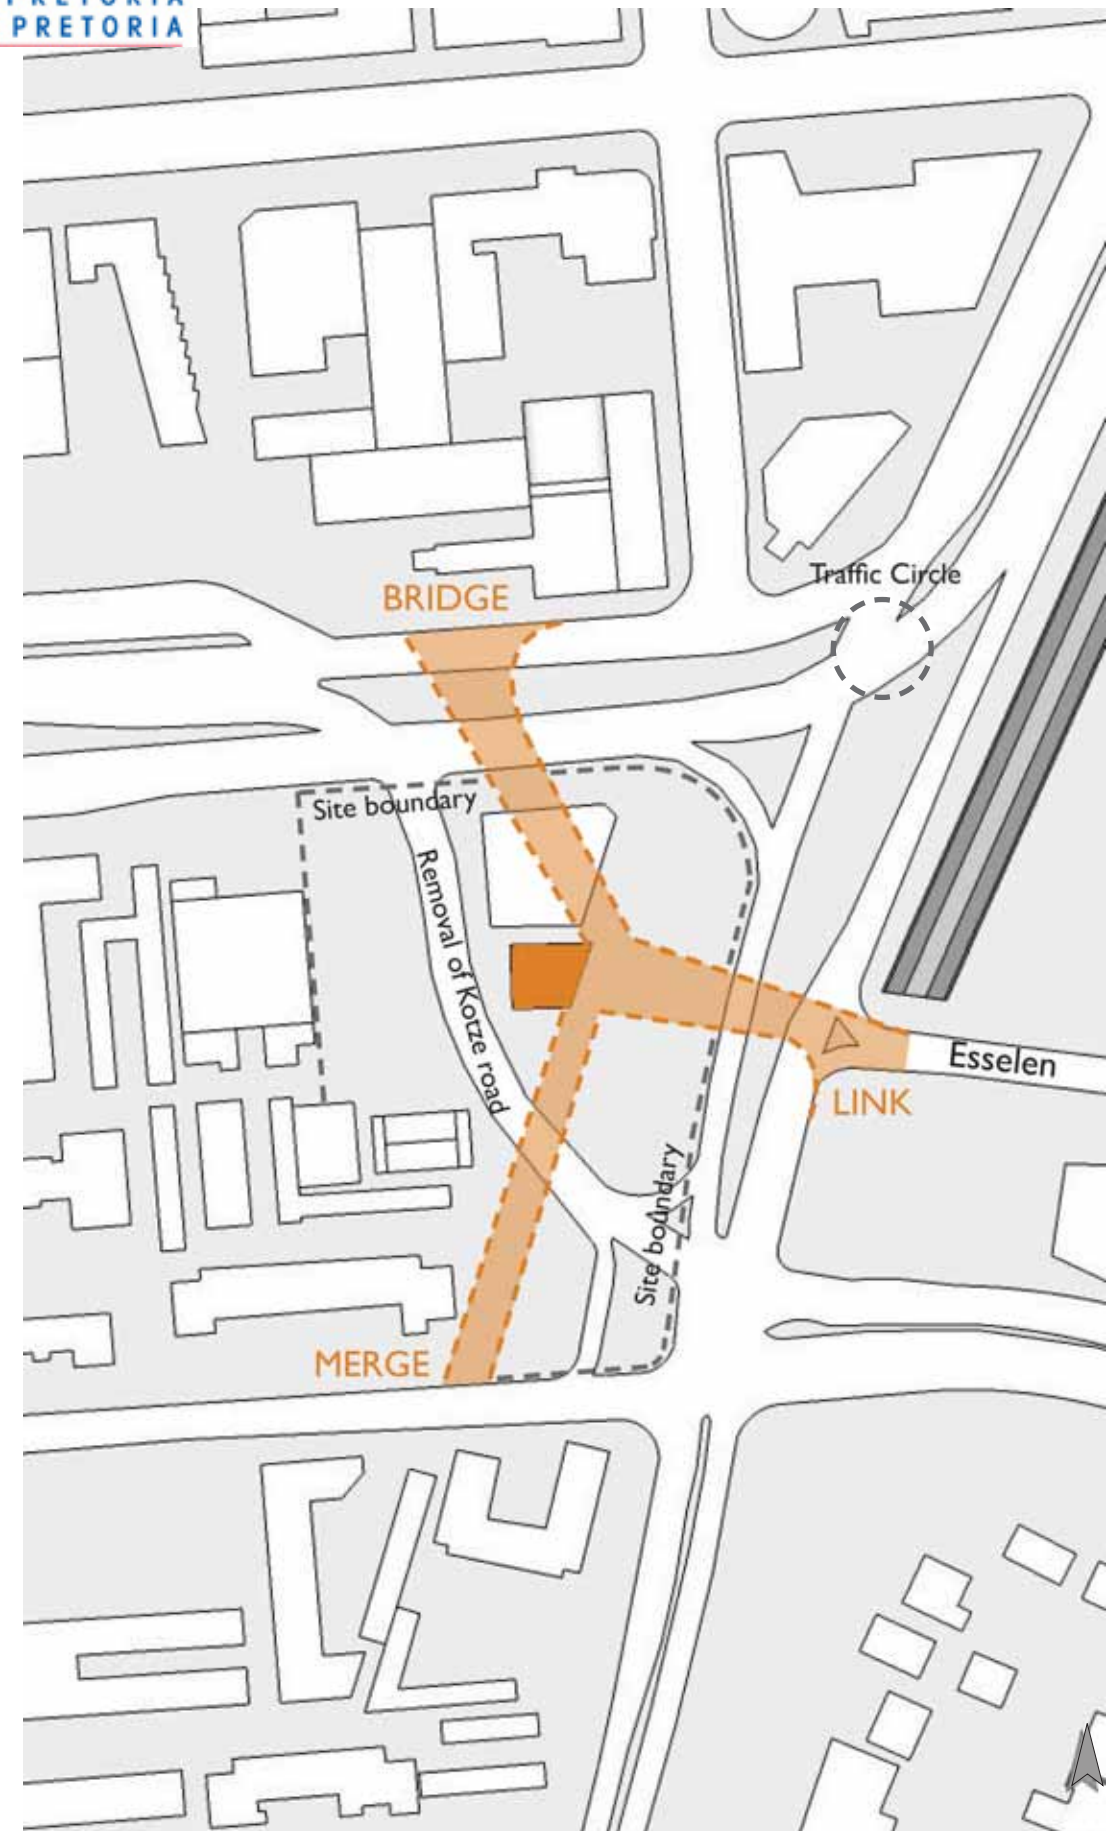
Plan showing the connections made to the existing fabric to allow pedestrian movement (Author, 2010)
